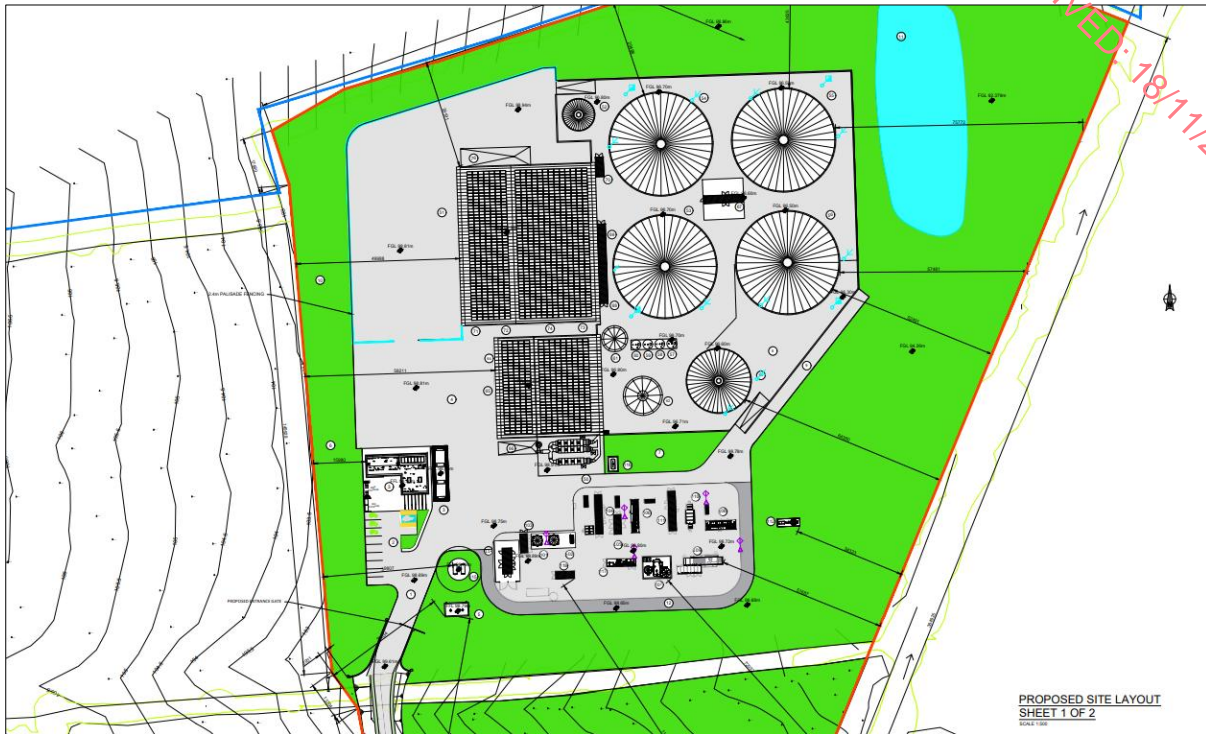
Extract from Layout Plan – Reg. Ref.: 24/60536 [Source: Extract from Layout Plan – Reg. Ref.: 24/60536]
